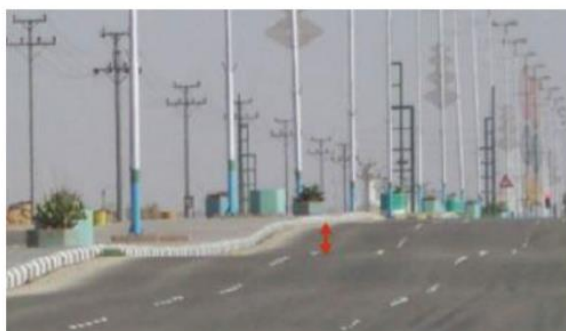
Uplifting of flexible pavement due to expansive soil (Jalal et al., 2020).
